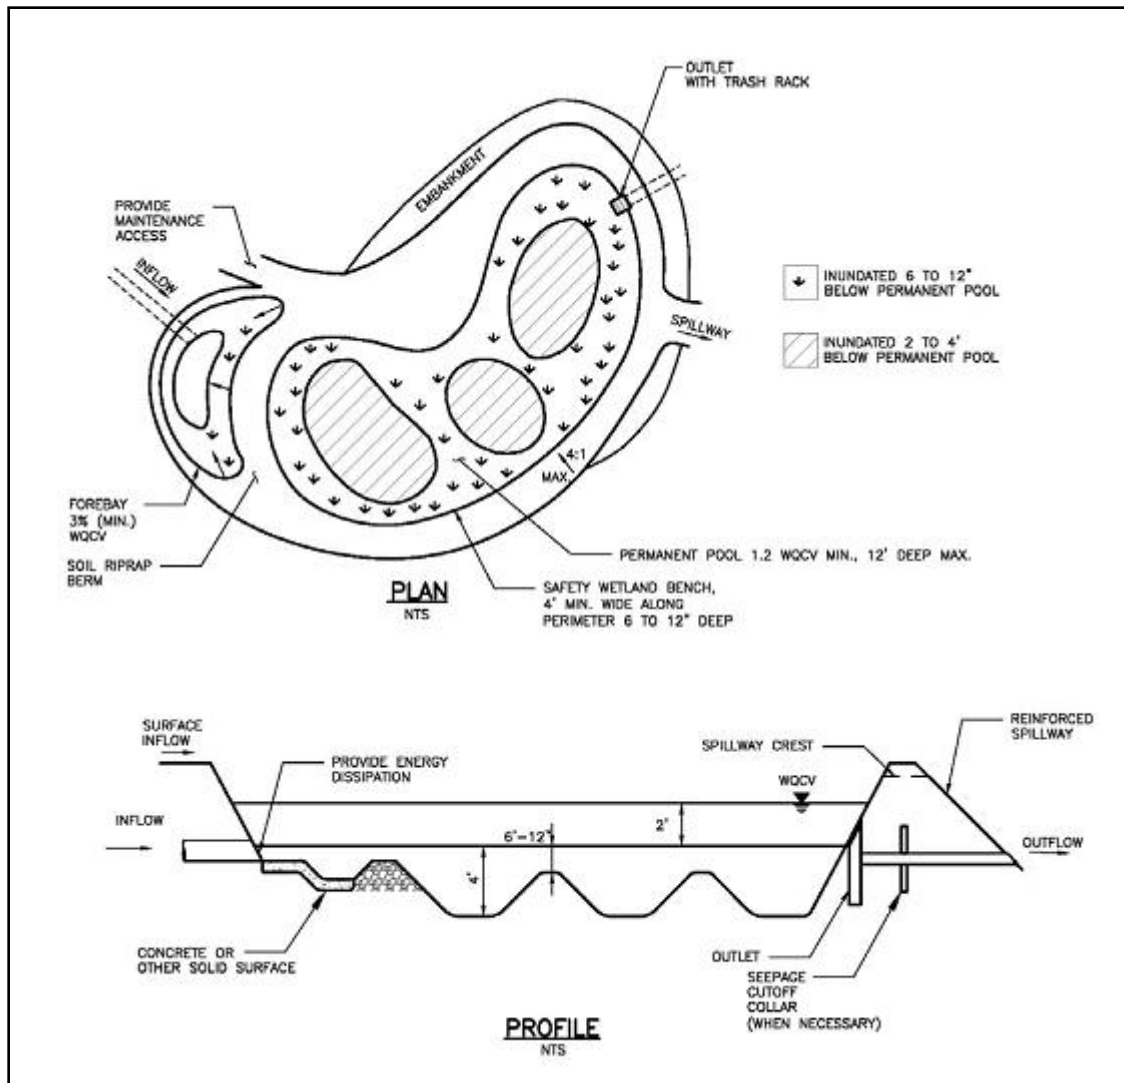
Typical Constructed Wetland Layout (UDFCD 2010)
